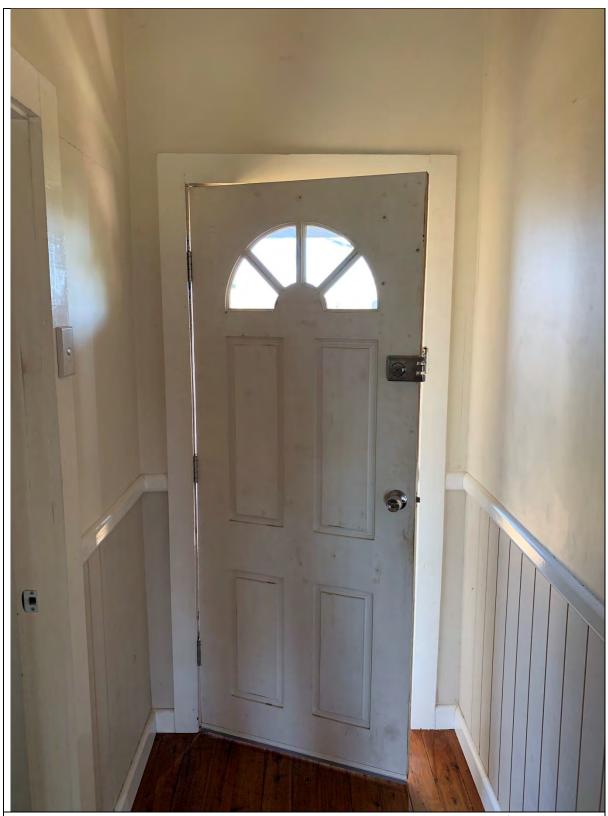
View towards the west showing the door located on the southern side of the site. The door, walls and ceiling are covered with lead-based paint.
